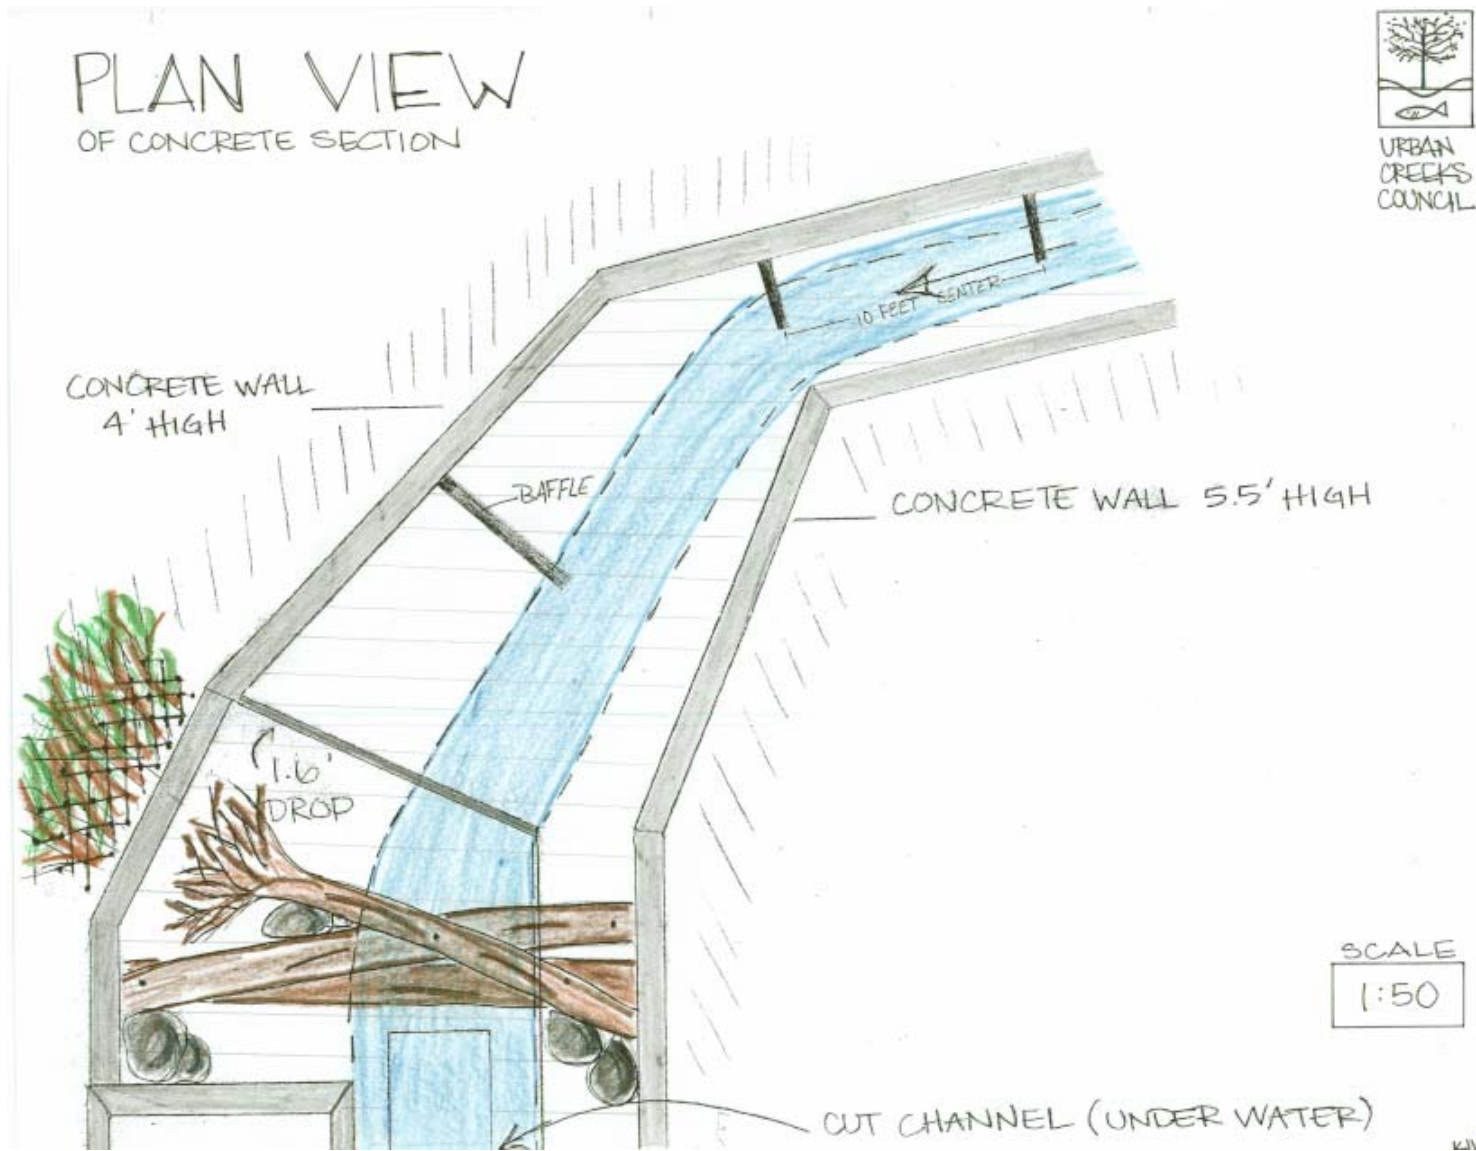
Plan view of engineered log structure and baffles to be installed to modify the concrete channel which acts as an existing barrier to fish passage.
